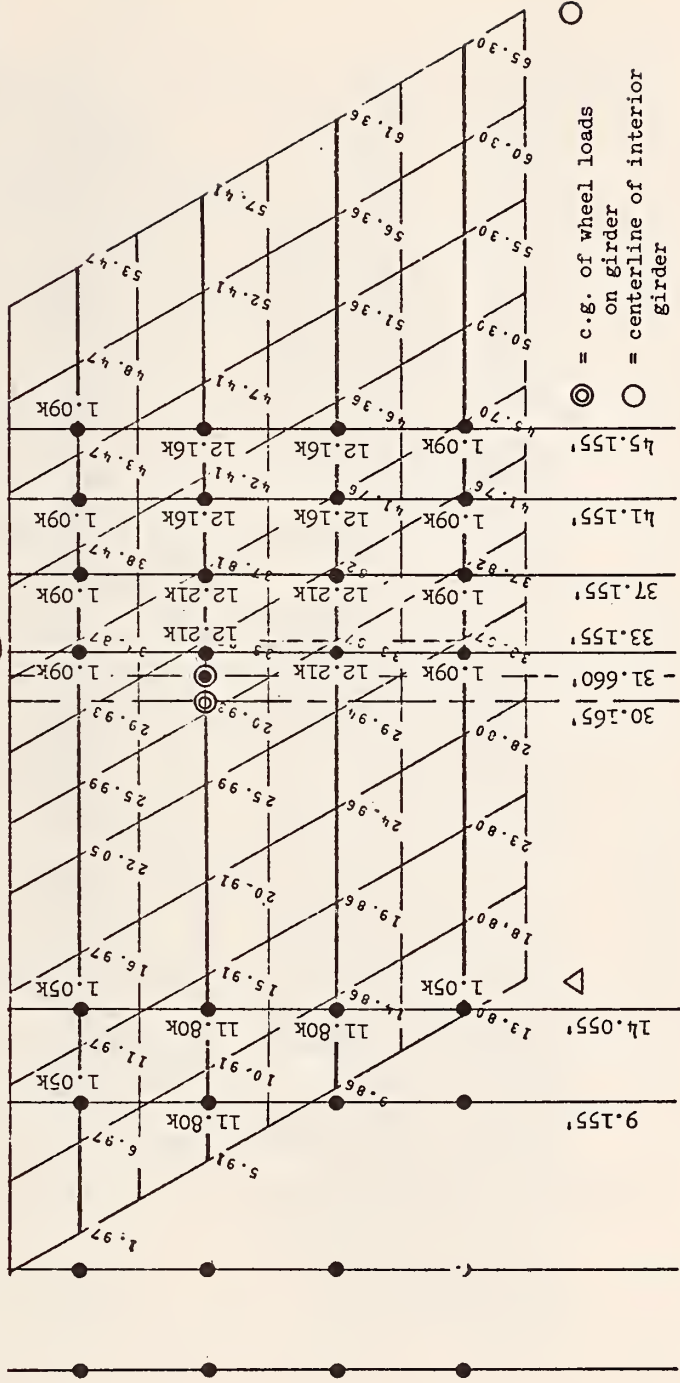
LOAD CONDITION 3, BRIDGE 3. CENTER OF GRAVITY OF HET-70 LOADS REMAINING ON INTERIOR GIRDER PLACED TO SATISFY MAXIMUM MOMENT CRITERIA FOR INTERIOR GIRDER.
